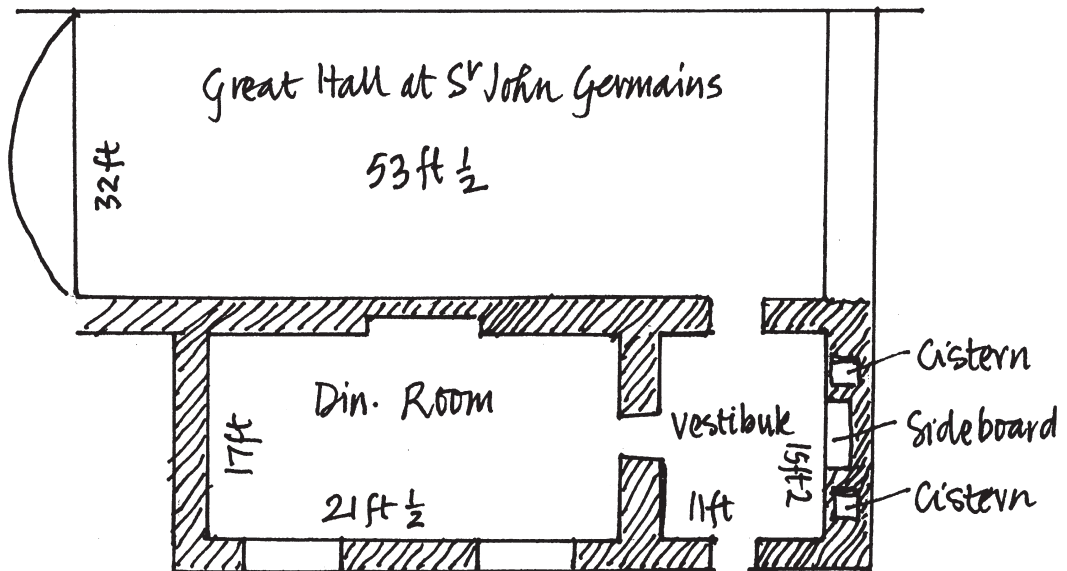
Conjectural reconstruction of the buffet at Drayton — plan based on Thornhill's sketch plan, by Bruce Bailey, 2008
